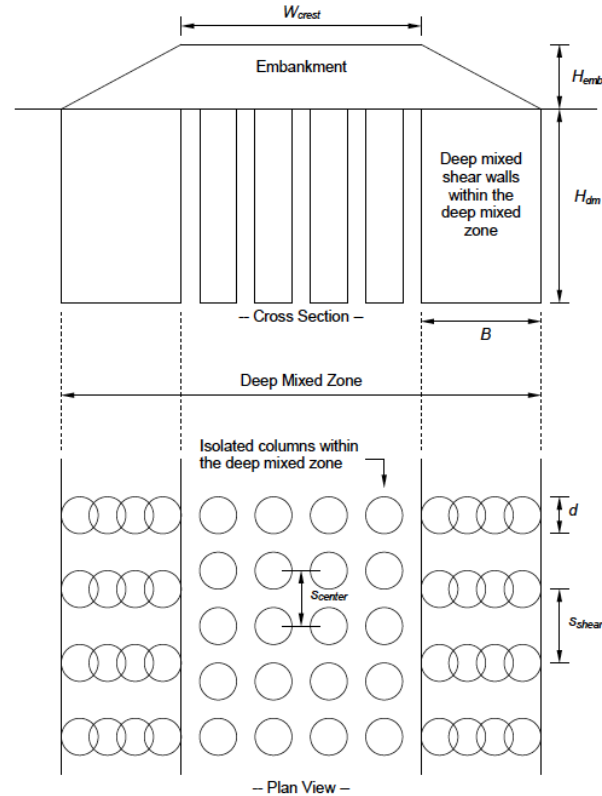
Typical arrangement for deep-mixed zone beneath an embankment (Bruce et al. 2013)
